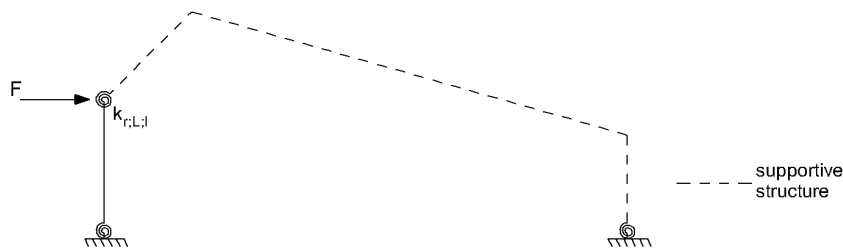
Model to determine the critical buckling load of the left-hand column (separate column approach 1)
